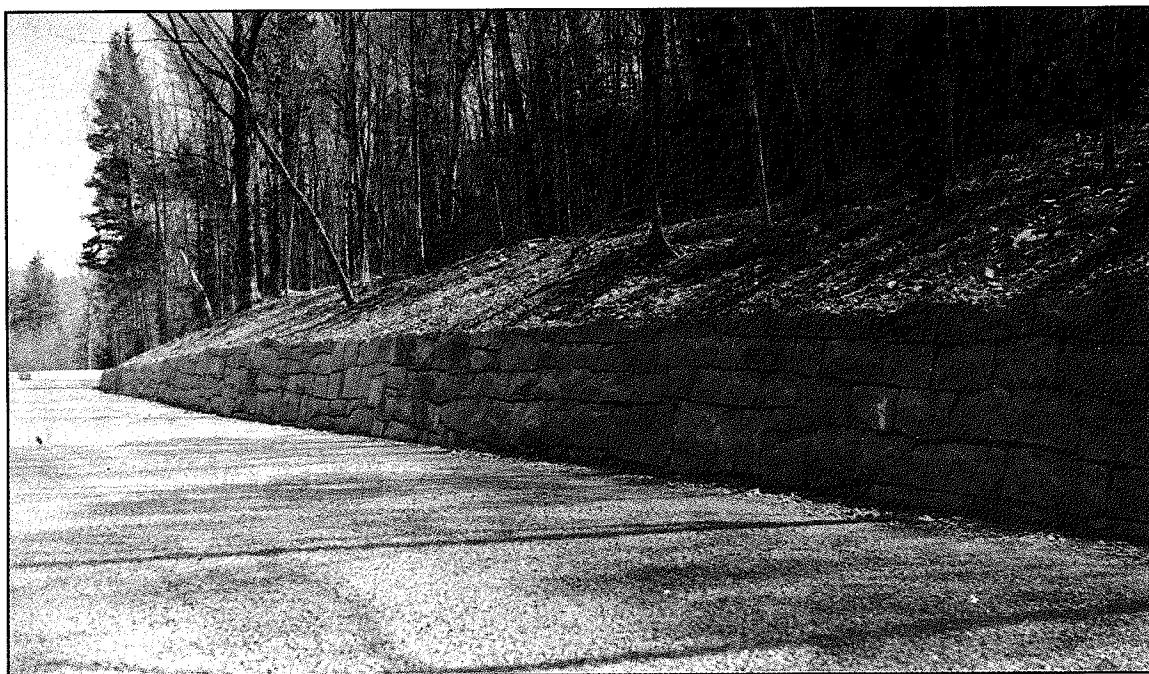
Kebo Mountain Road, dry-laid stone retaining wall, 1938. Photograph from BPR, *Progress Views*.
